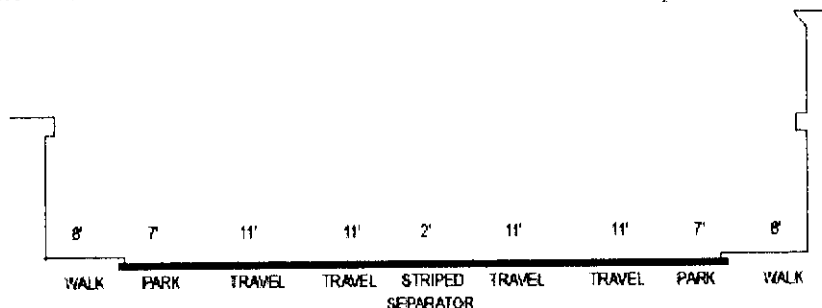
Cross-Section 50 Feet West of Main Street, Looking West
